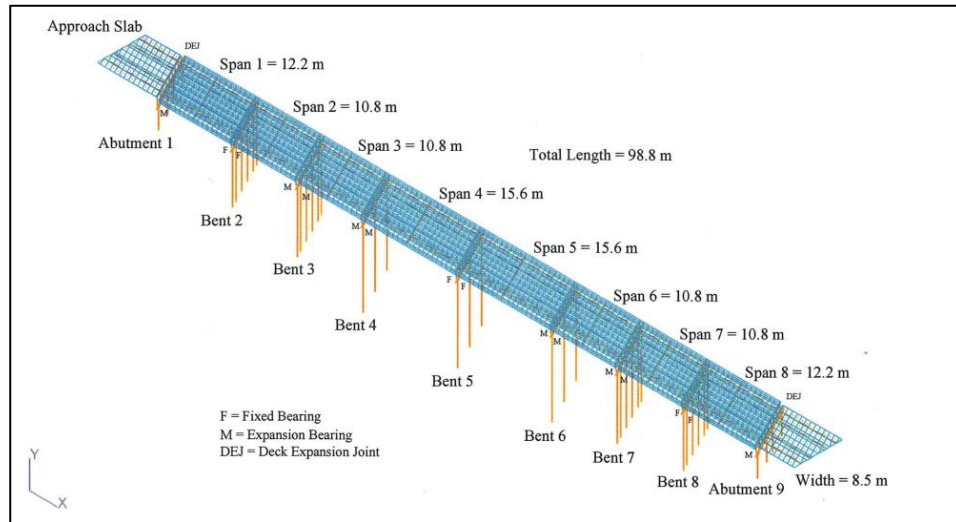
FEM model by (Okelo et al., 2011) for elevated steel bridge
